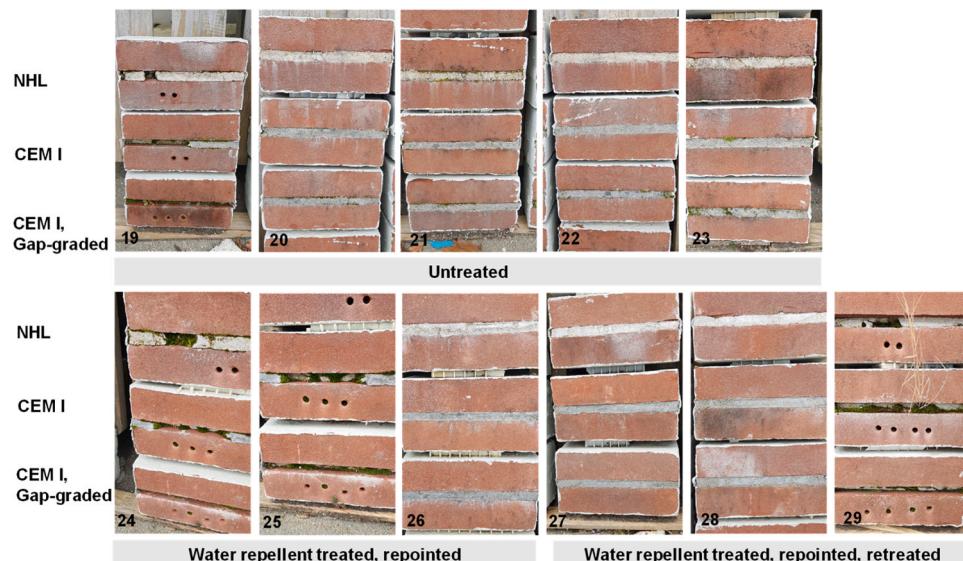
Masonry walls after 2.5 years outdoor exposition. The absence of the pointings and the holes in some of the bricks are due to previous sampling.
